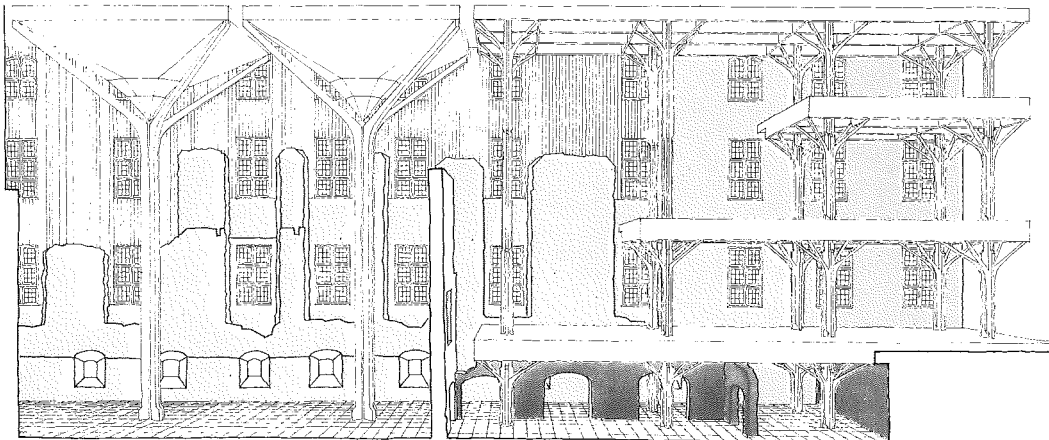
A longitudinal section of the south wing. The principle of the construction is based on load-bearing columns and beams of laminated timber placed independently of the ruined walls. The aperture in the south wall is closed with a timber curtain wall.
